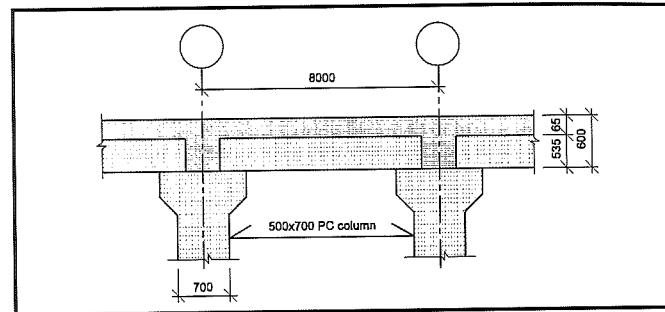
Typical Hollow Core Slabs/In-Situ Slabs Details
